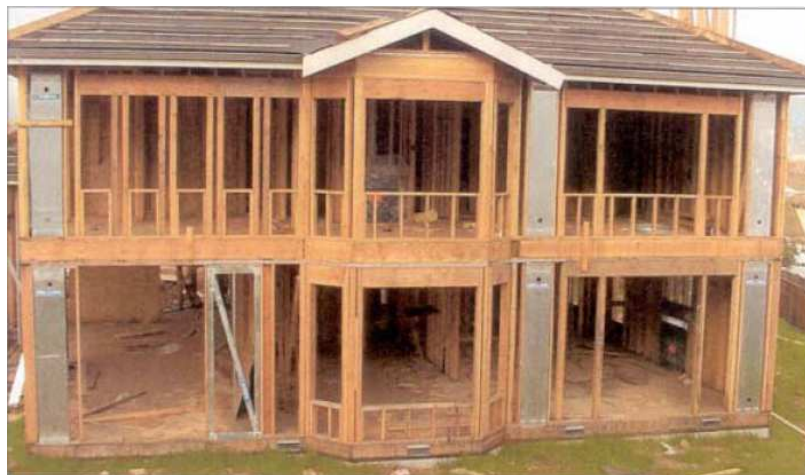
Wide opening with narrow braced wall panels (Source: APA publication)
